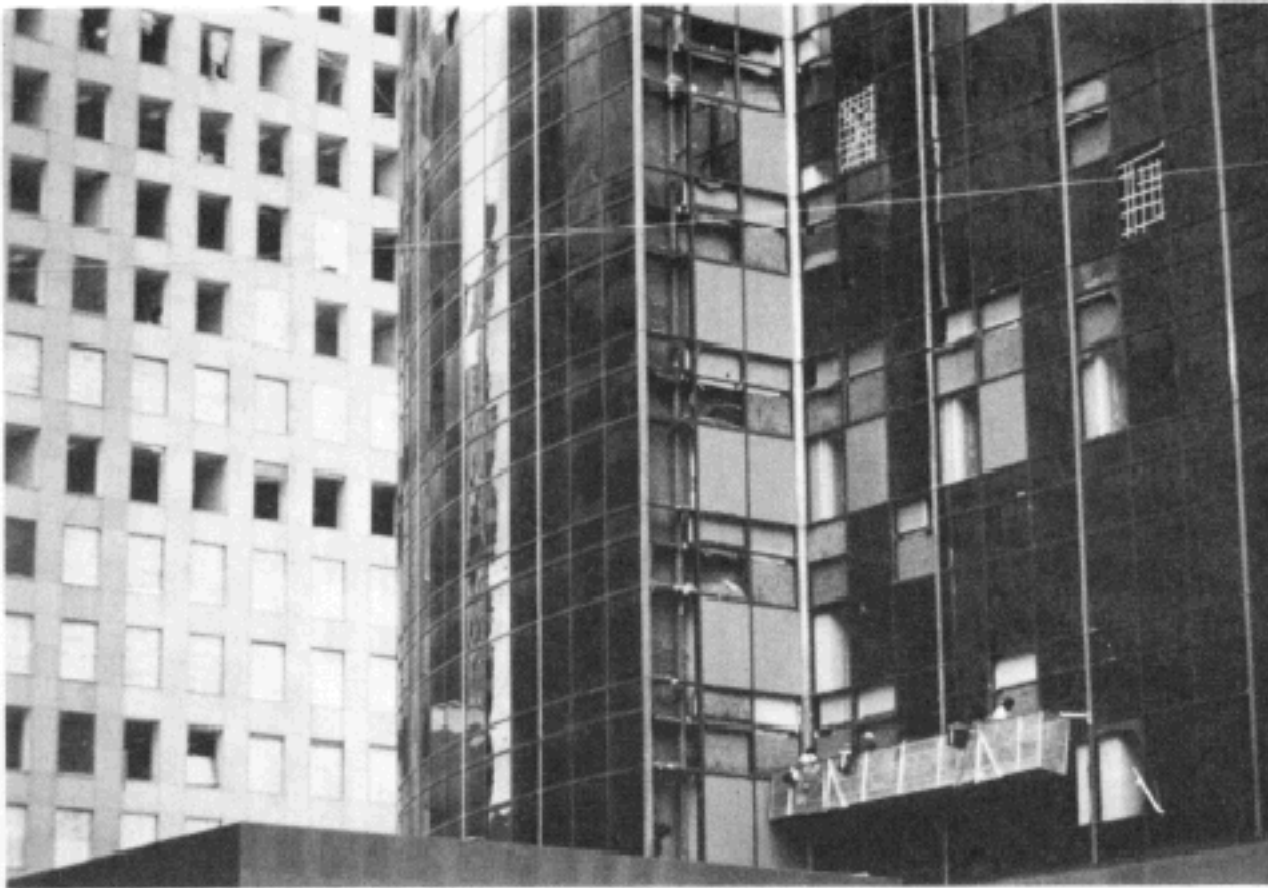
Closeup of damaged glass on the Allied and Inter-First towers.
